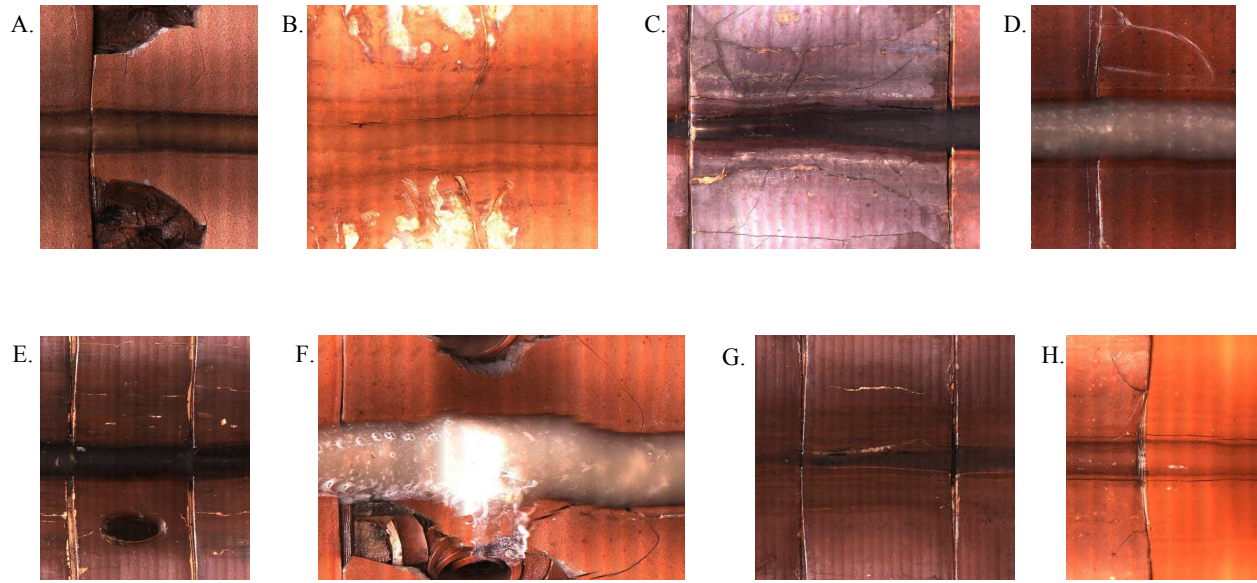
Defects captured in the level 3 irregular feature cluster. (A, D, H) - Defects at pipe joints (B) - vertical cracks, (C) - cracked pipe segment, (E) - horizontal crack, (F) - Defects at pipe connection, (G) - horizontal crack, (H) - vertical cracks
